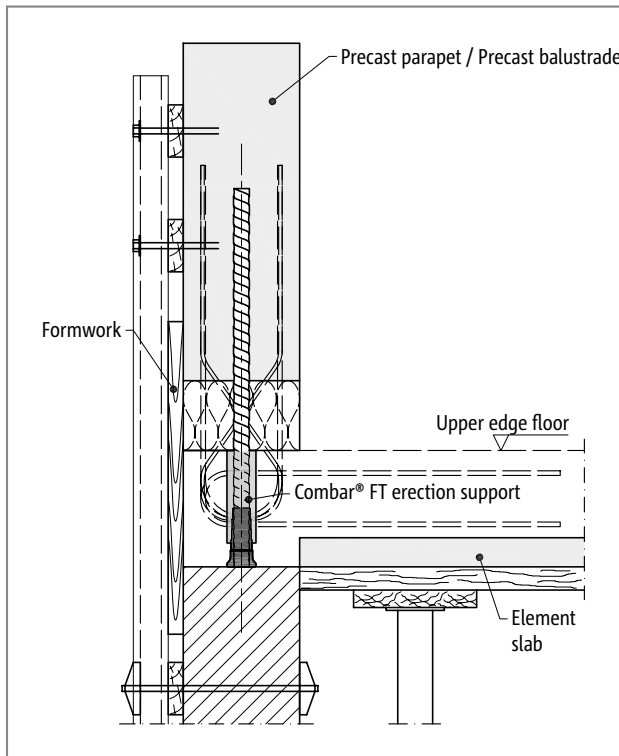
Schöck Combar® FT erection support: Installation in a precast concrete parapet; section
